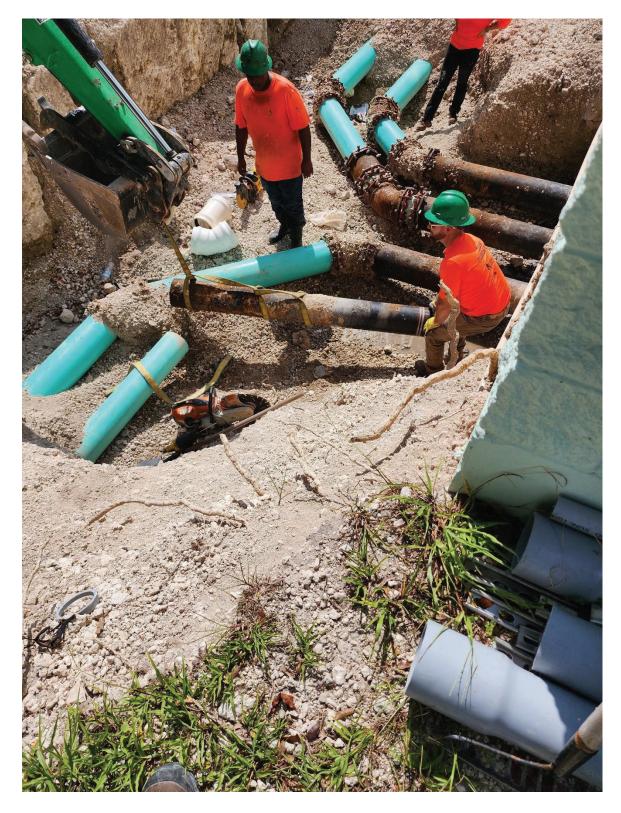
Installing New 8"SDR-21 PVC with 2 New 8"SDR-21 PVC 45 Bends at North Exterior of Vacuum Station A
